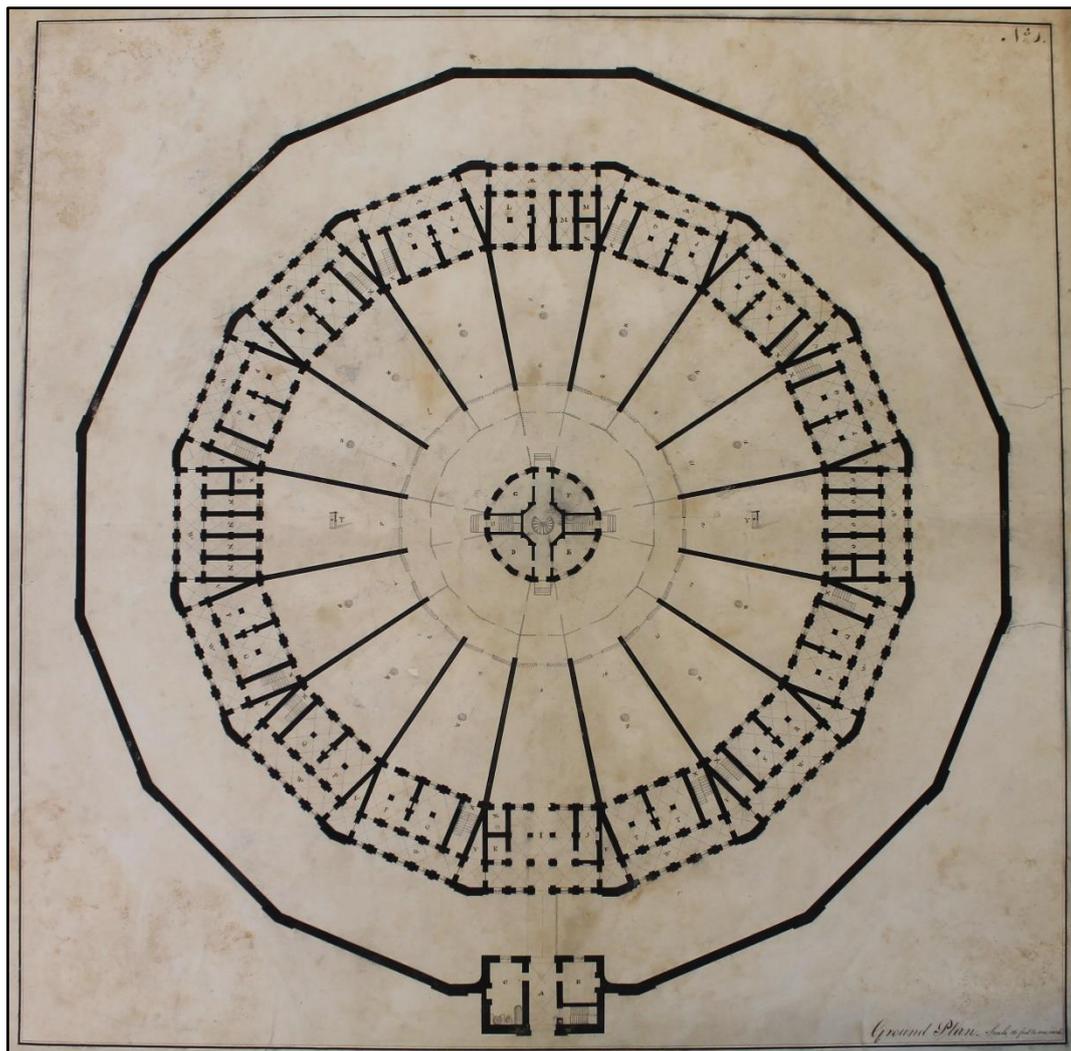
Devises house of correction, Wiltshire, ground-floor plan. Richard Ingleman, 1808-17. Competing with the radial plan was the polygonal, which had many supporters, including Ingleman, who built similar gaols in Southwell (Nottinghamshire) and in Sligo. Much of the penal-reform debate of the 1810s concerned the relative advantages of both plans. Reproduced courtesy of Wiltshire and Swindon Archives.
